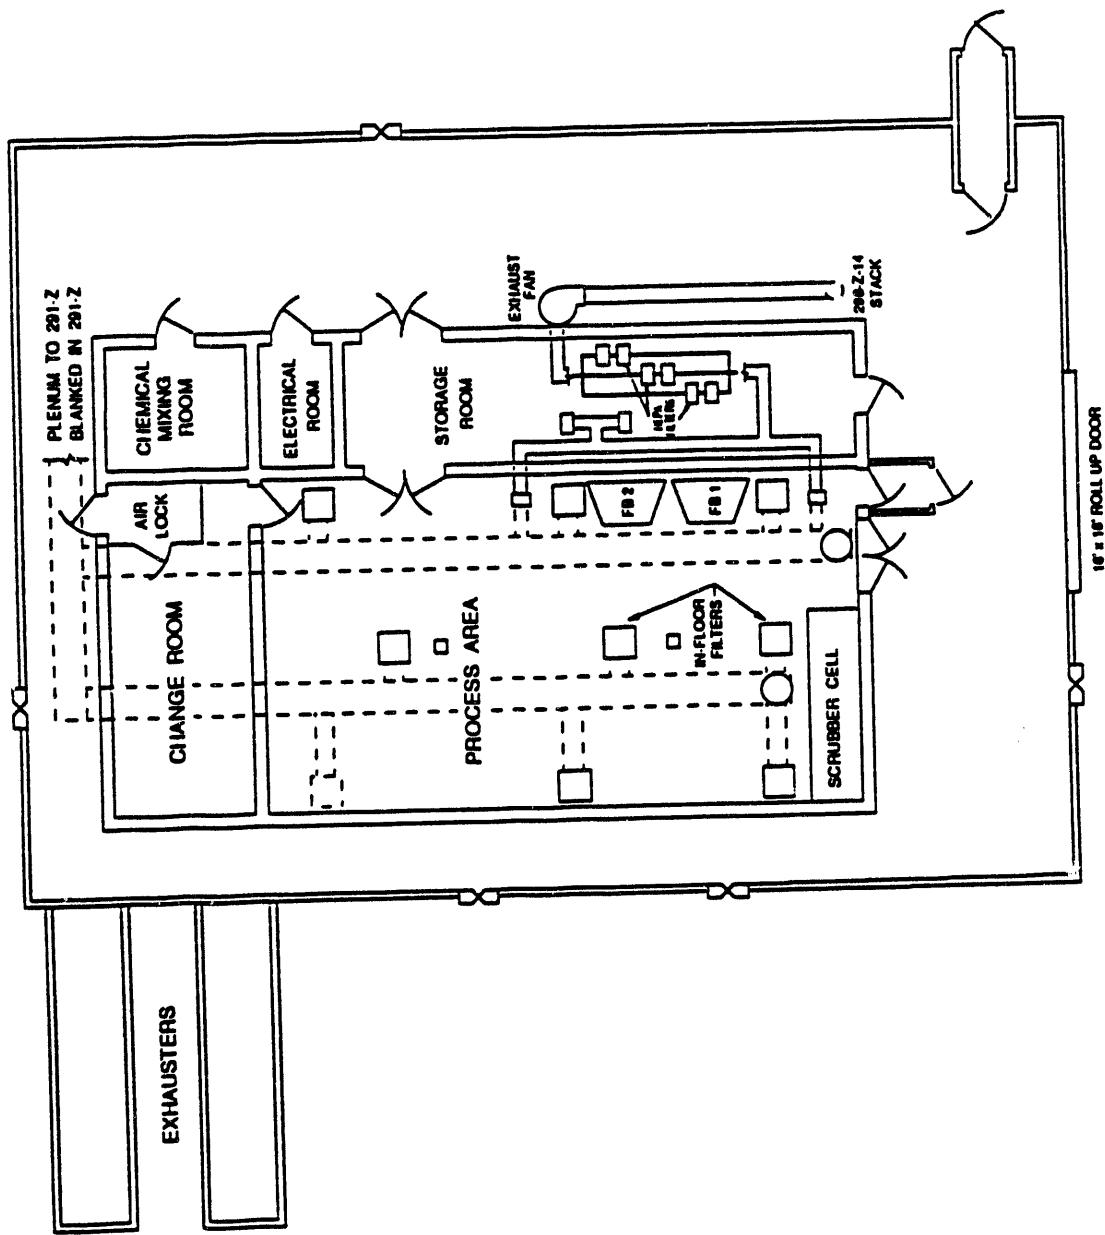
CONFINEMENT BUILDING LAYOUT FOR THE 232-Z FACILITY
